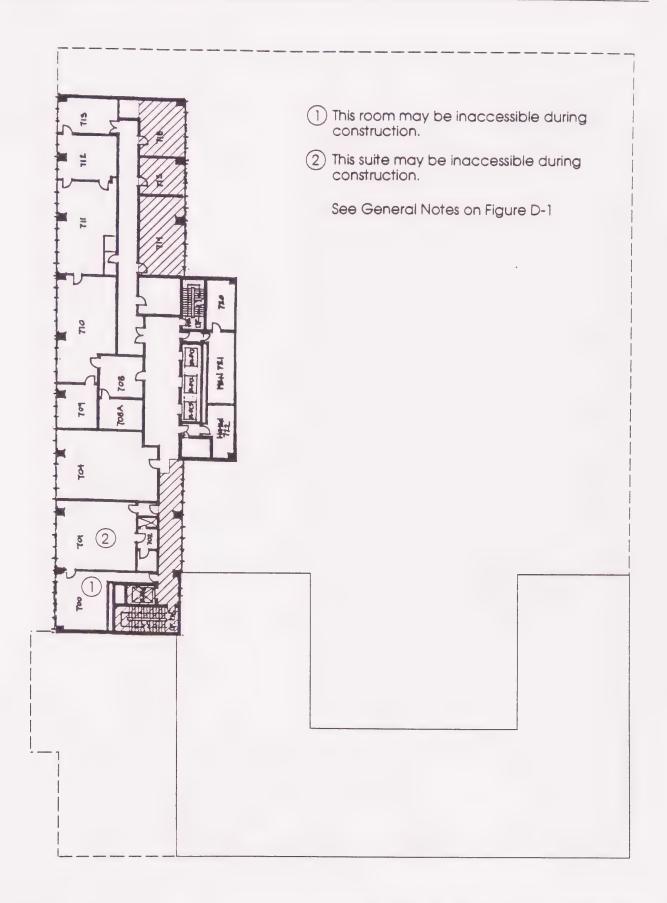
7th Floor Plan Showing Areas Impacted by Construction
